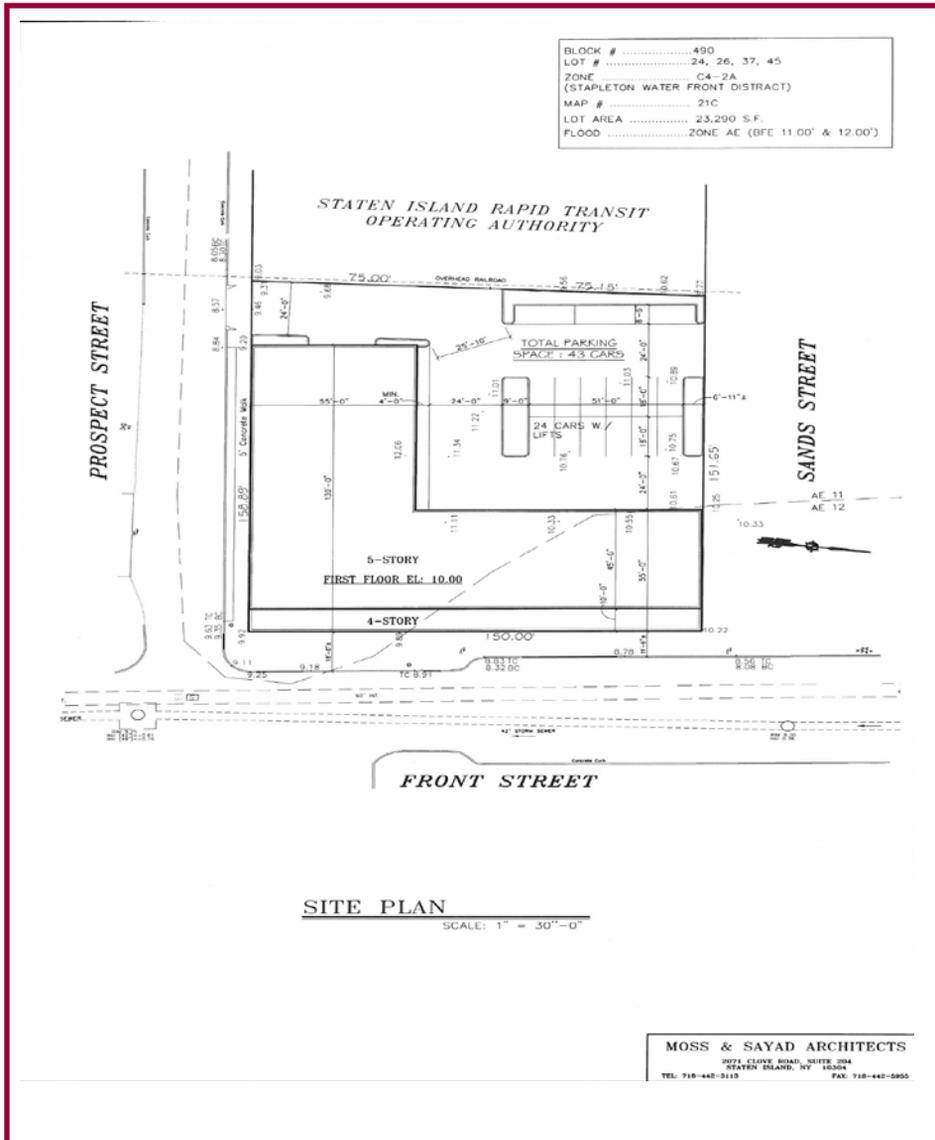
PROPOSED DEDEVELOPMENT PLAN
